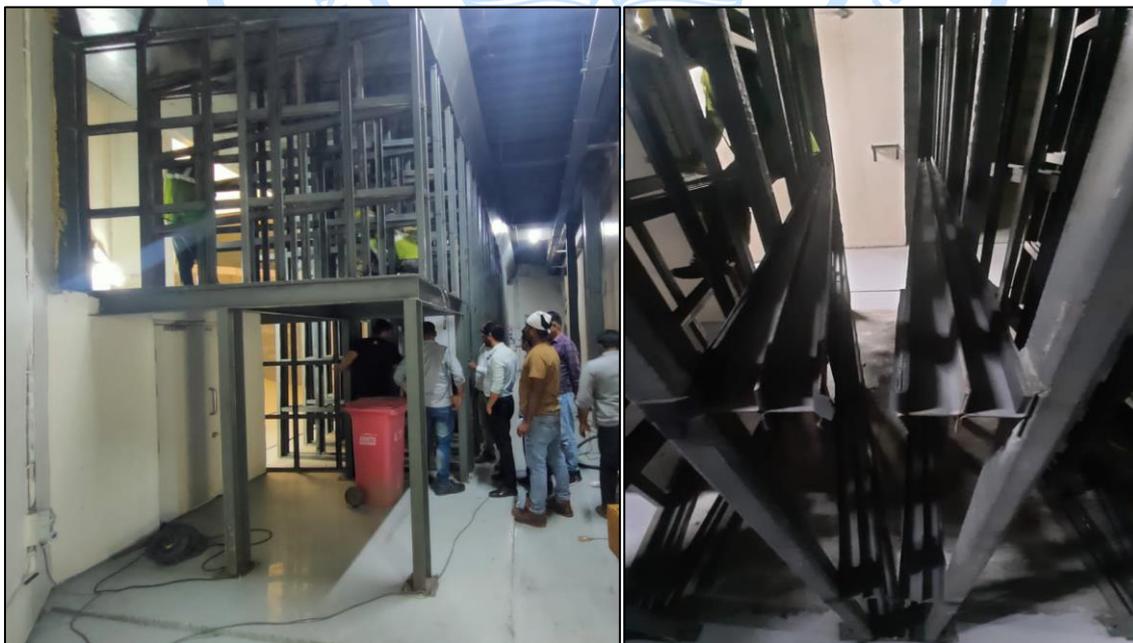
Filter frame assembly cleaning prior to fresh filters placement.
